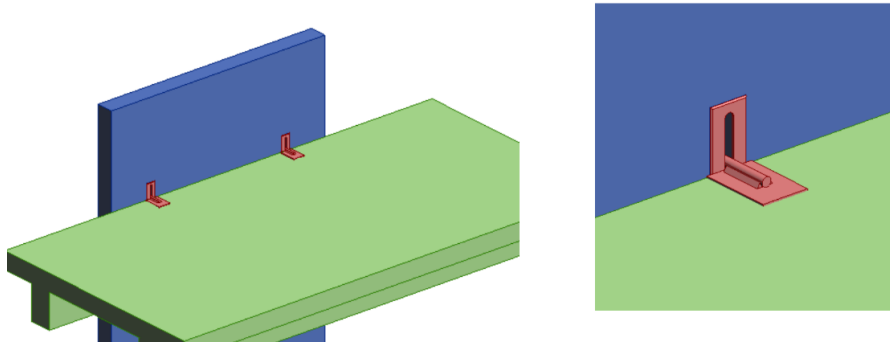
Slotted connection used on parallel precast slabs (isolated connection) (Henry, 2011)
